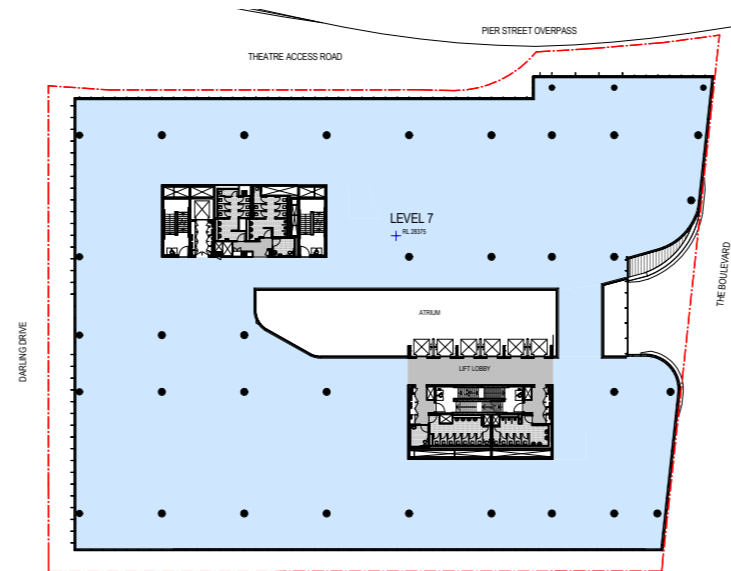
Section 96 NW Plot proposed Level 7 Plan
